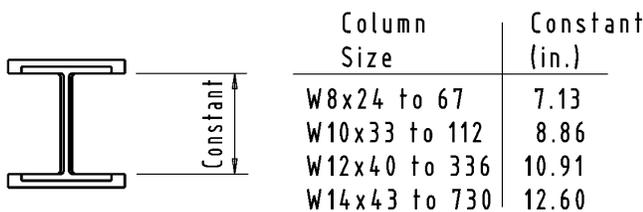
Full bearing of lighter sections when they are centered over heavier sections, for the listed weight groups.
